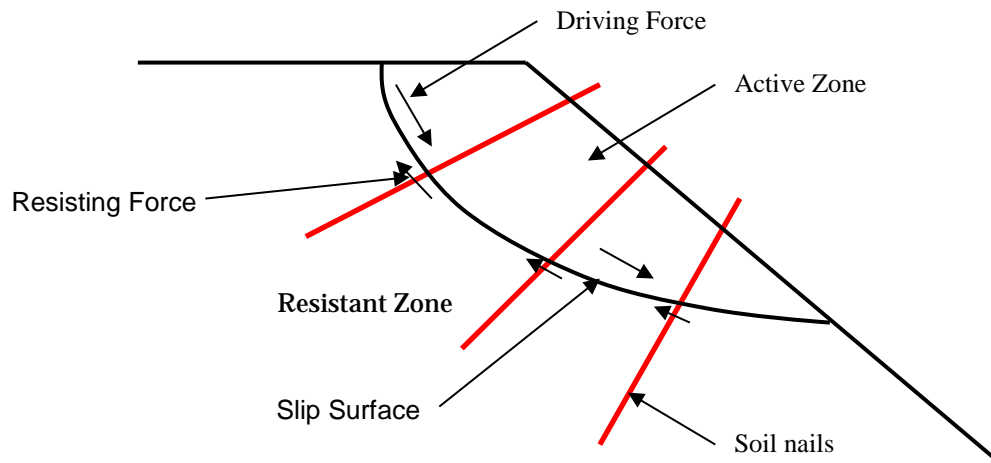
Schematic of Repair of soil nails in slope stabilization (replotted after Titi and Helwany, 2007)
